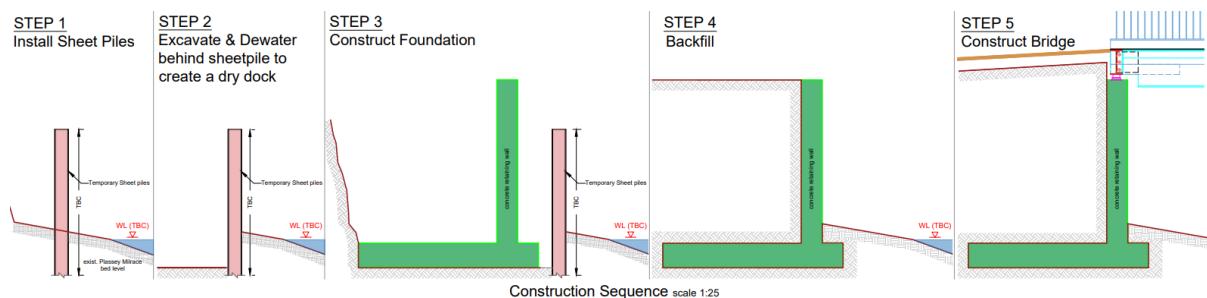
Construction sequence for abutment structures to support the steel deck of Bridge 5 (refer to drawing RHA-XX-DR-S-SP0052)
